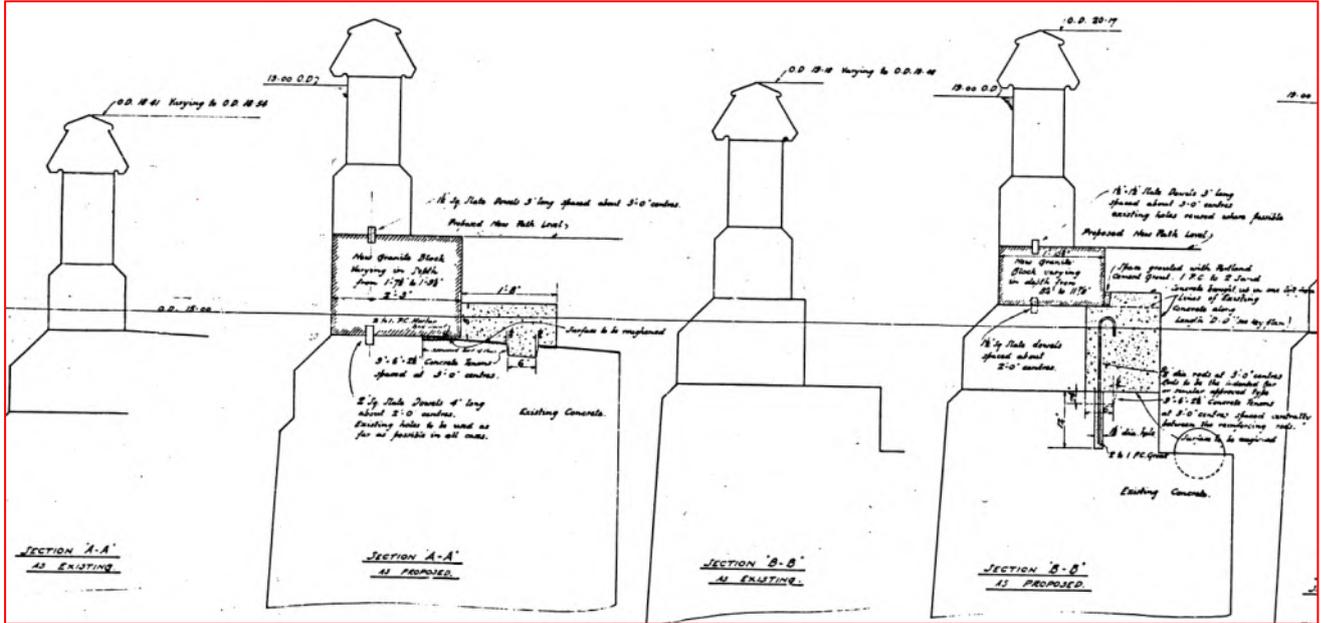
Extract of 1933 Proposed Raising of Riverwall Drawing 1981
